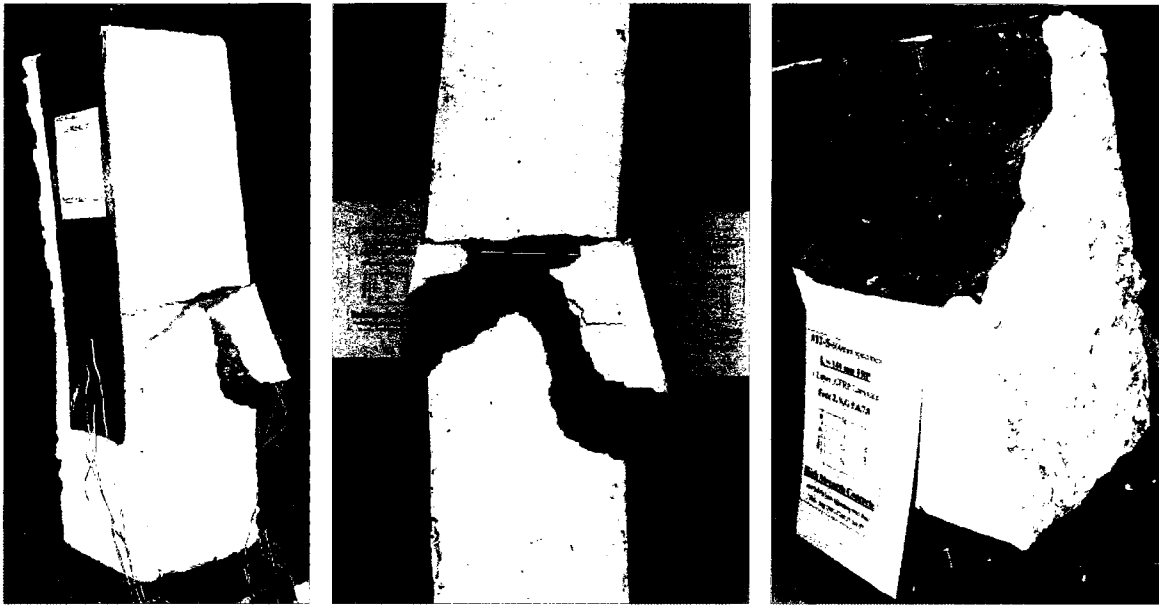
Governing the rebar when deep diagonal cracking happened in Specimen #12-5 with high strength concrete (76 MPa) and 140mm bond length
